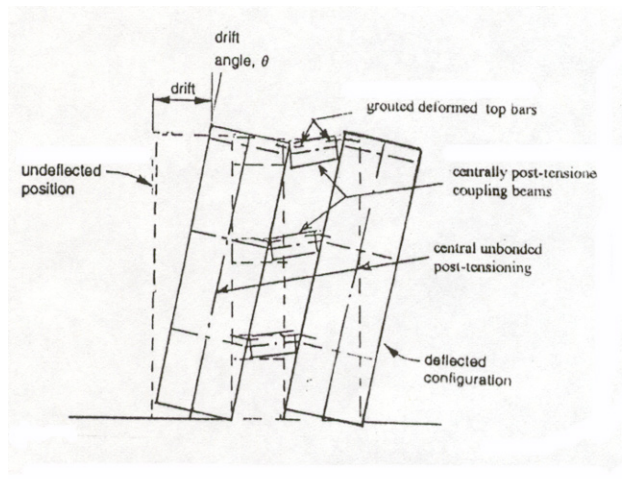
(a) Coupled wall test module with coupling beams.
